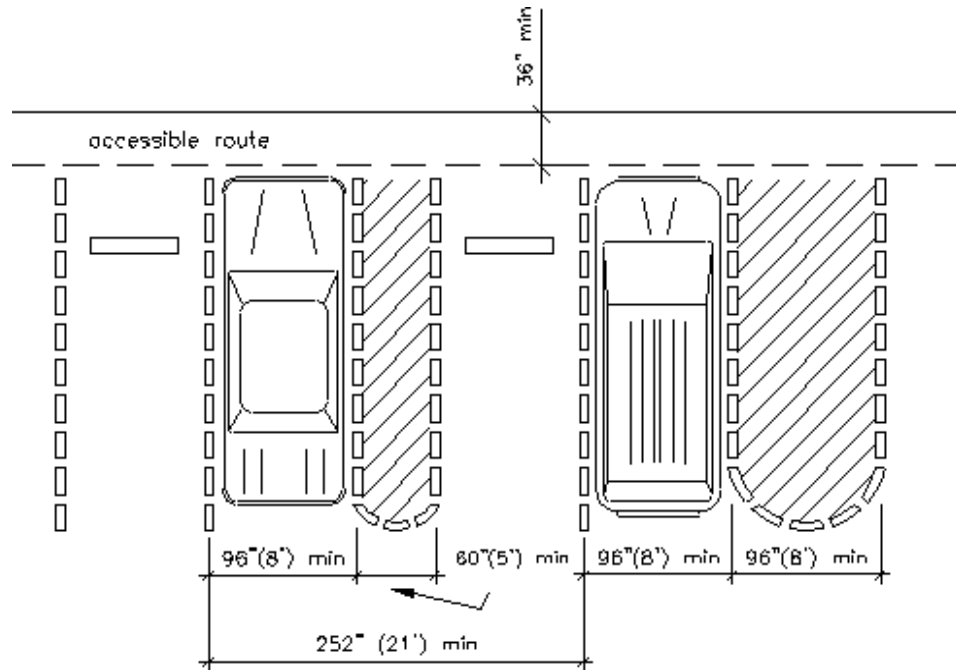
ADA Minimum Dimensions for Accessible Parking Stalls
